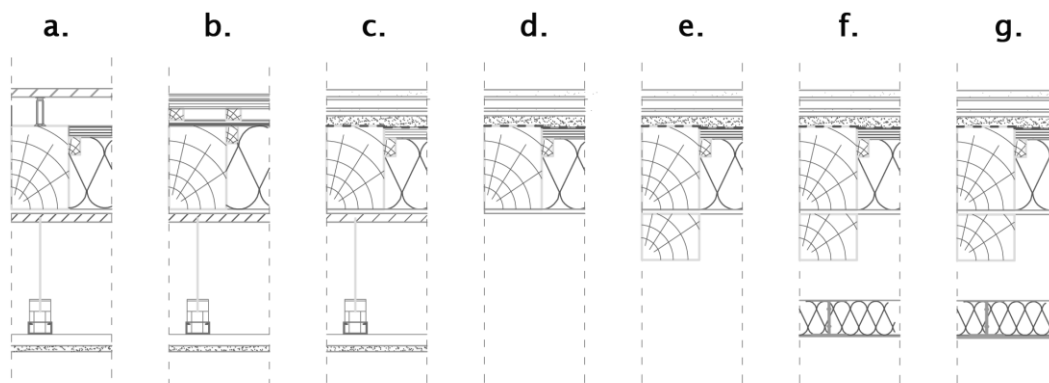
Fourth refurbished construction (g), new upper floor system, new free fully self-supported decoupled ceiling with double gypsum cardboard layer
